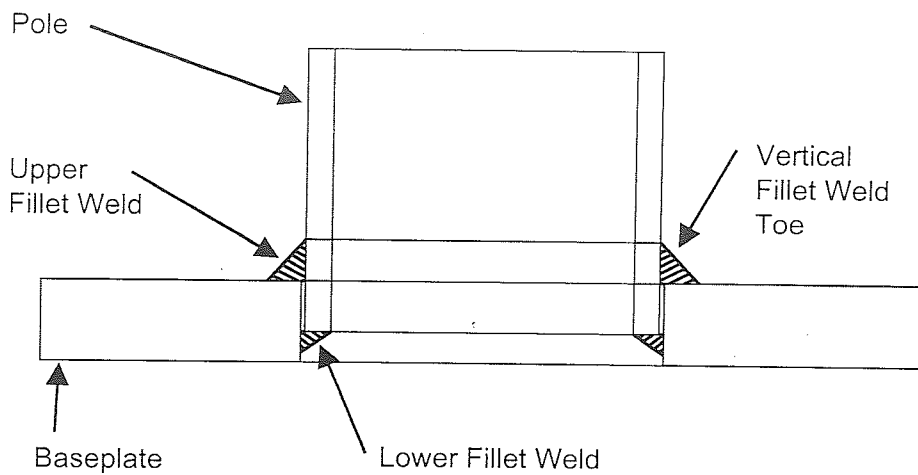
Schematic Cross Section Through Socket Welded Connection
